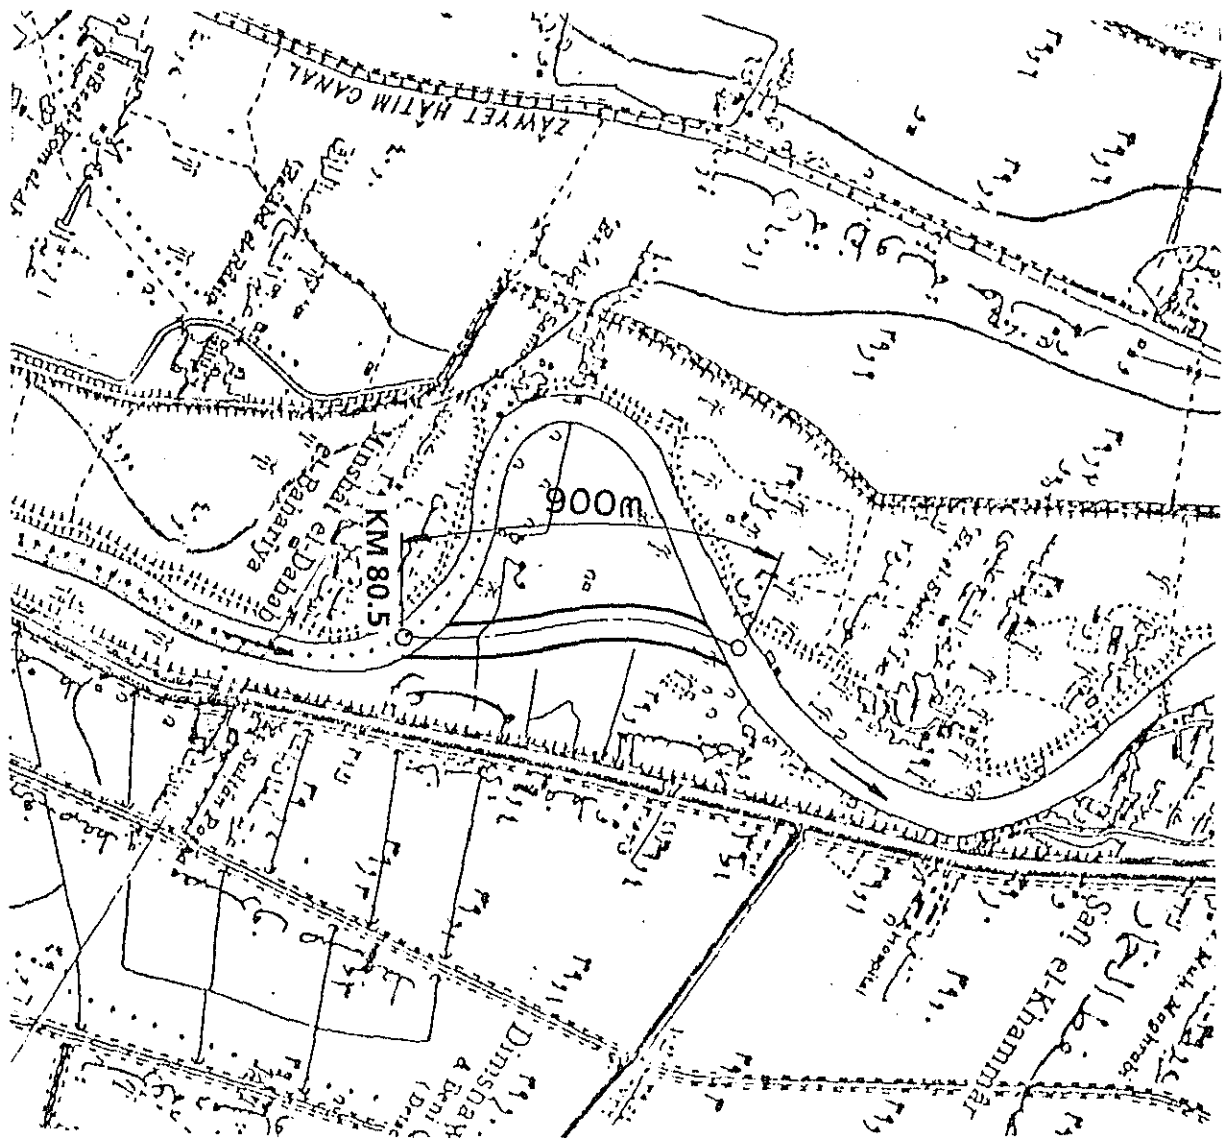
Proposed Shortcut Plan at KM20.5
